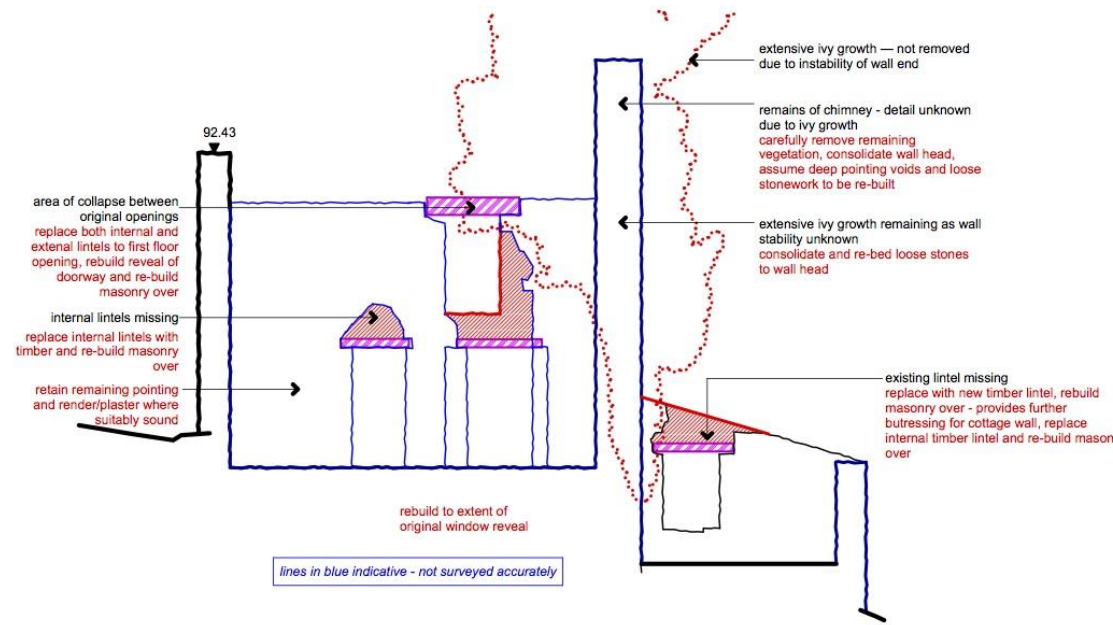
Trevear cottage 'as constructed' internal and external north elevations (© Pdp Green Dwg. No. J13037-4021P'B', 14/9/15).
